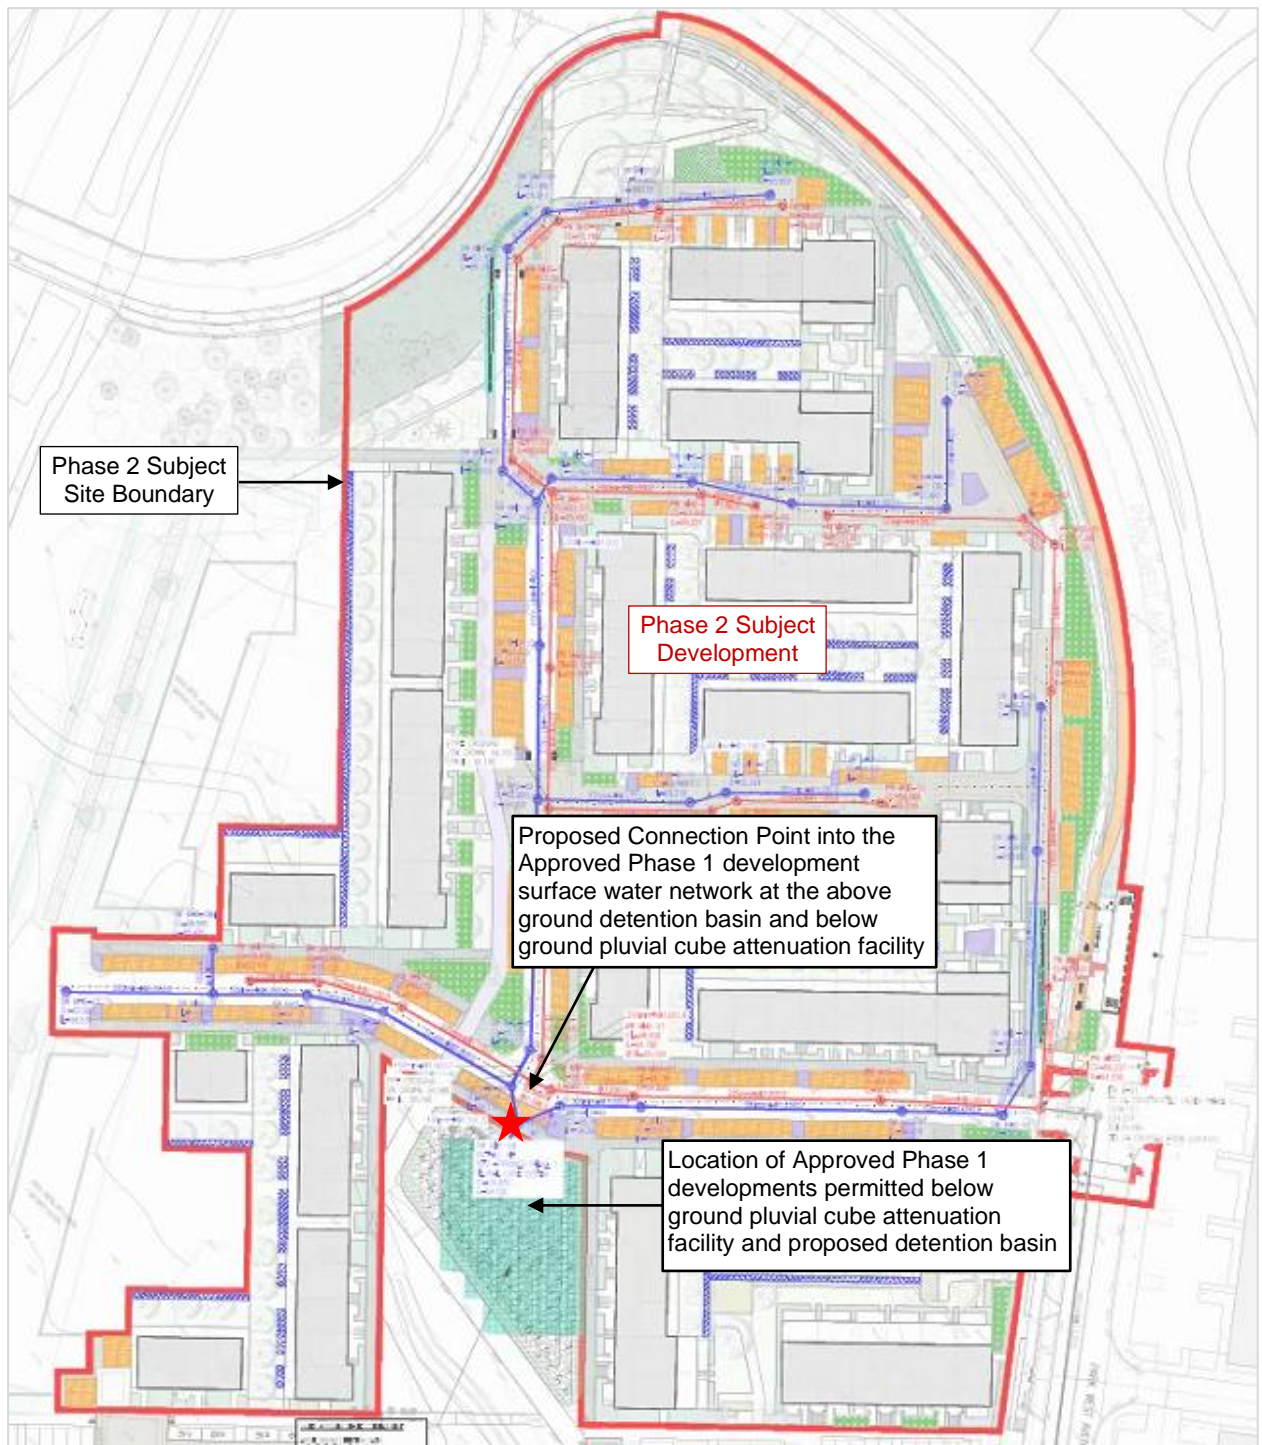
Subject Development's Proposed Surface Water Connection Point
